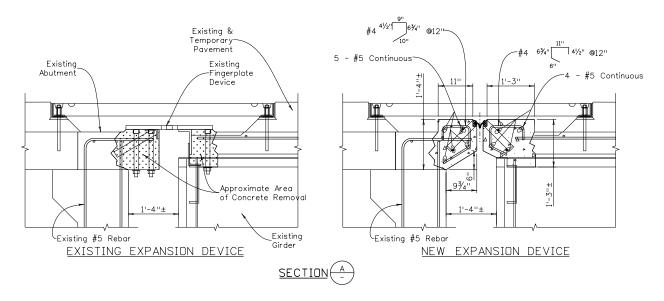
(B)-2 Sample Sections showing existing and proposed expansion joint devices
